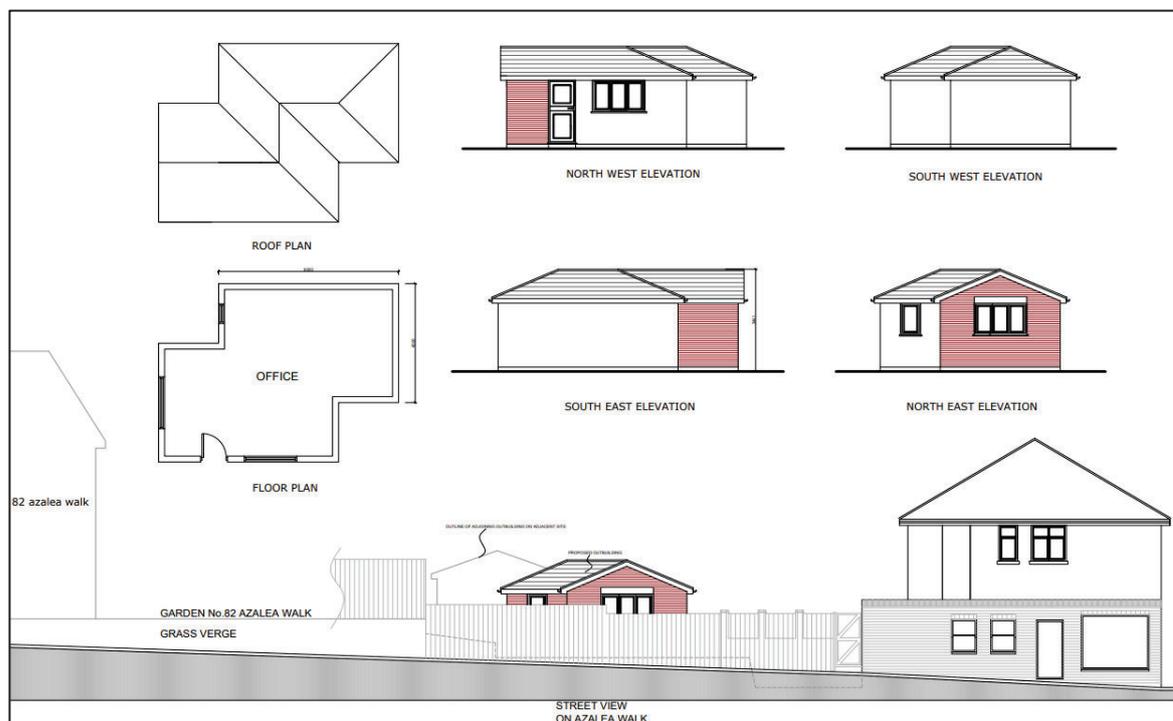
Proposed Plans and Elevations (please note – a larger version of plan can be found in the Committee Plan Pack)
